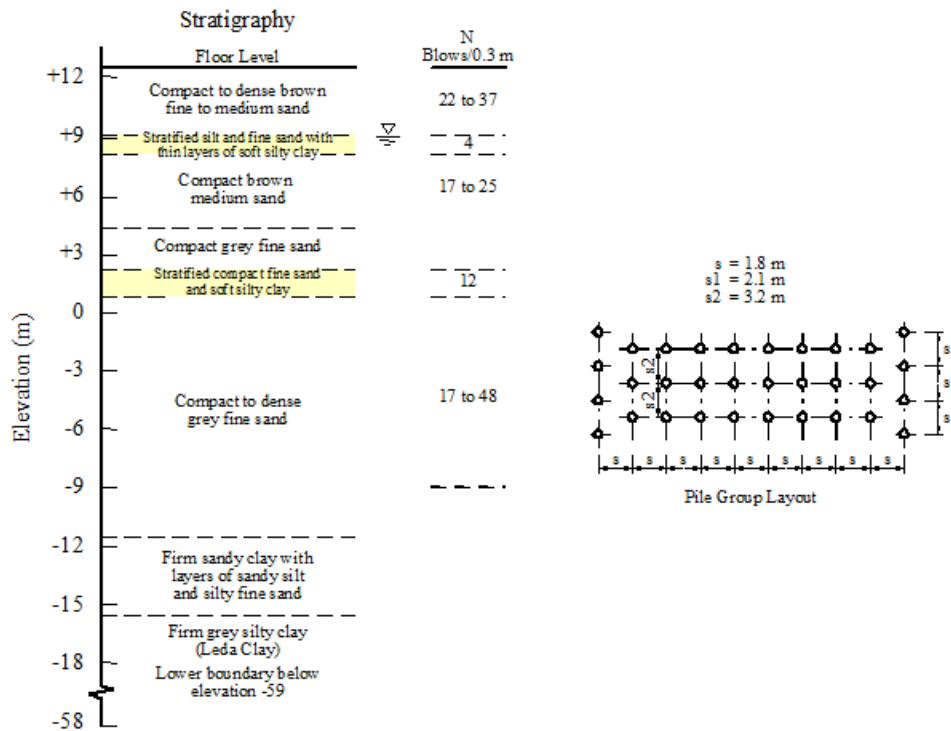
Stratigraphy and pile group layout for furnace foundation (Golder and Osler, 1968)
